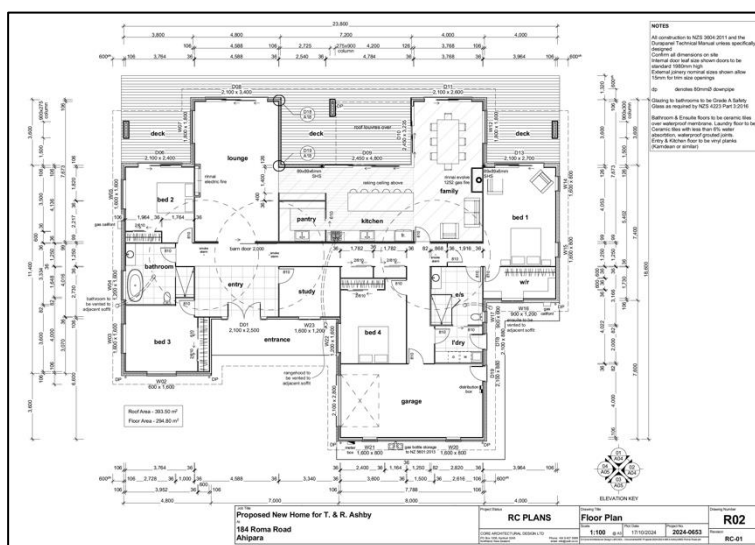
Proposed Scheme Plan [Source: Core Architecture]
